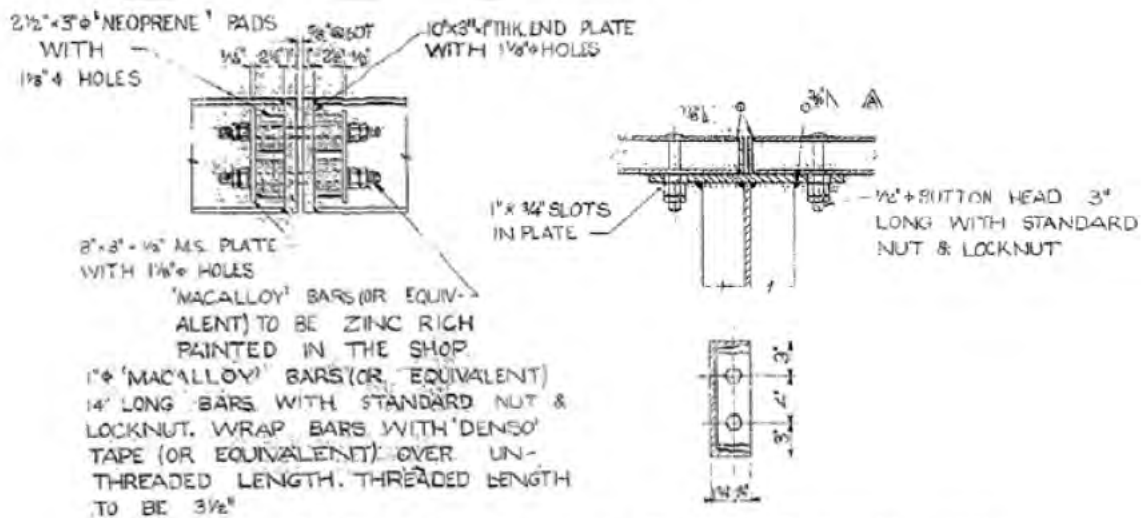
Rail Detail from Construction Drawings (Designed in 1968)
